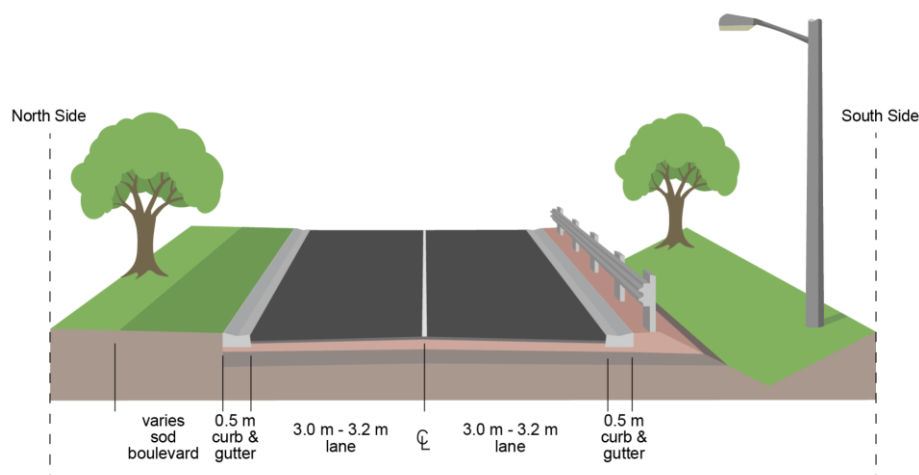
Alternative 2: Existing Cross-Section with Mountable Curb
